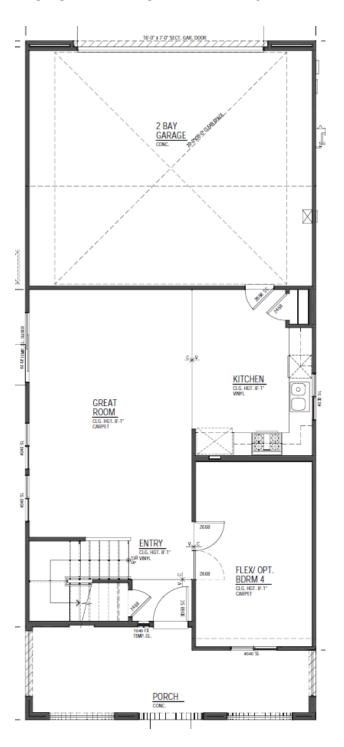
Exhibit B — FLOOR PLANS AND ELEVATIONS: ALLEY LOADED PLAN 3
